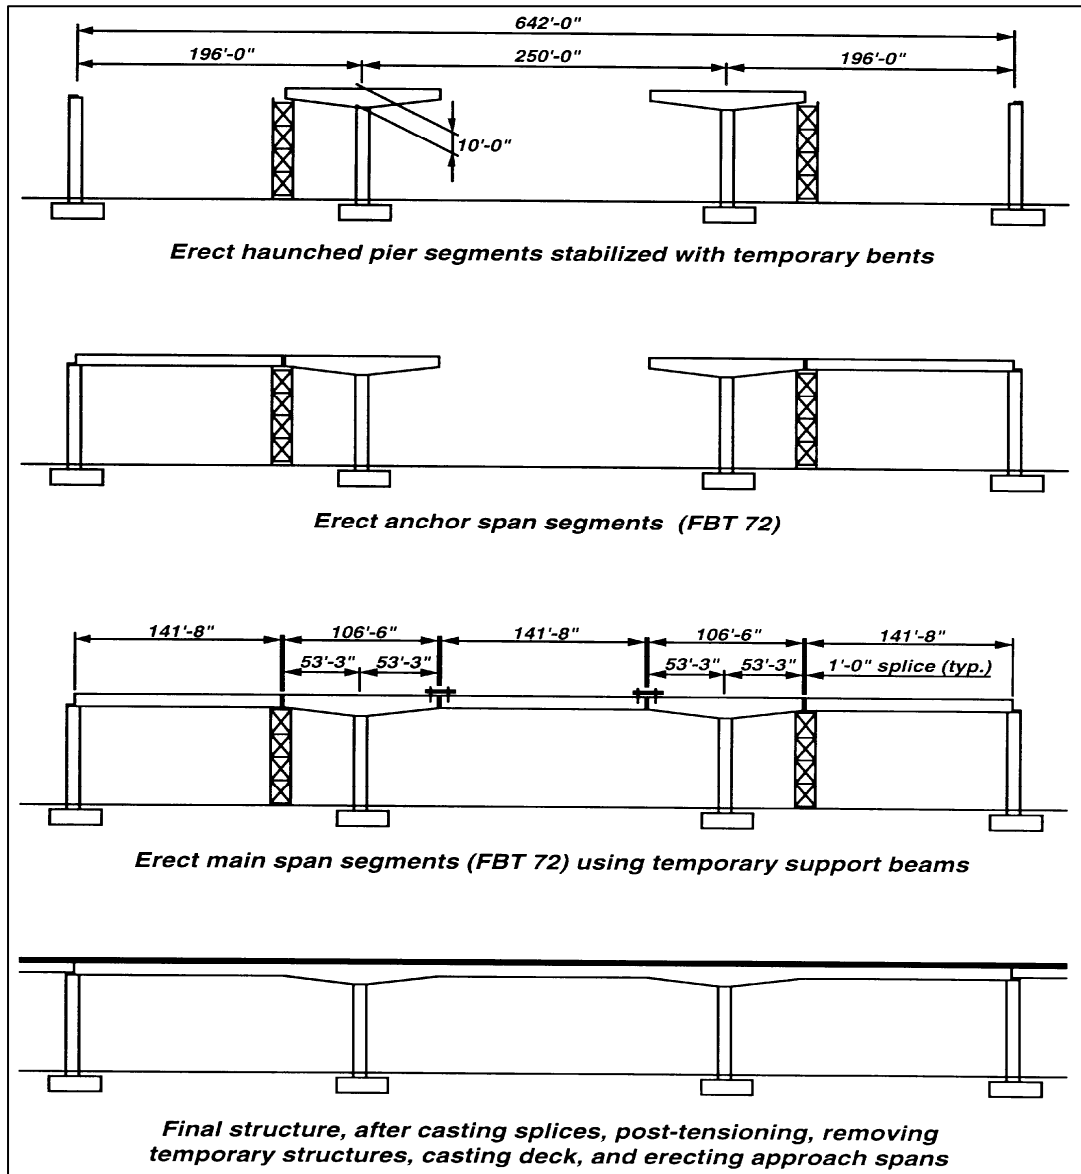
Typical Three Span Spliced Girder Construction Sequence
